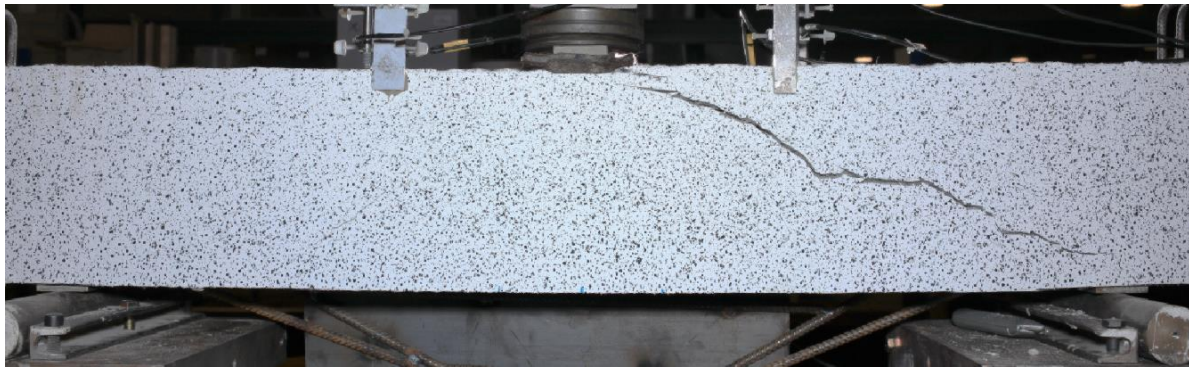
The final crack pattern of hybrid beam B2 with shear reinforcement [front view].
